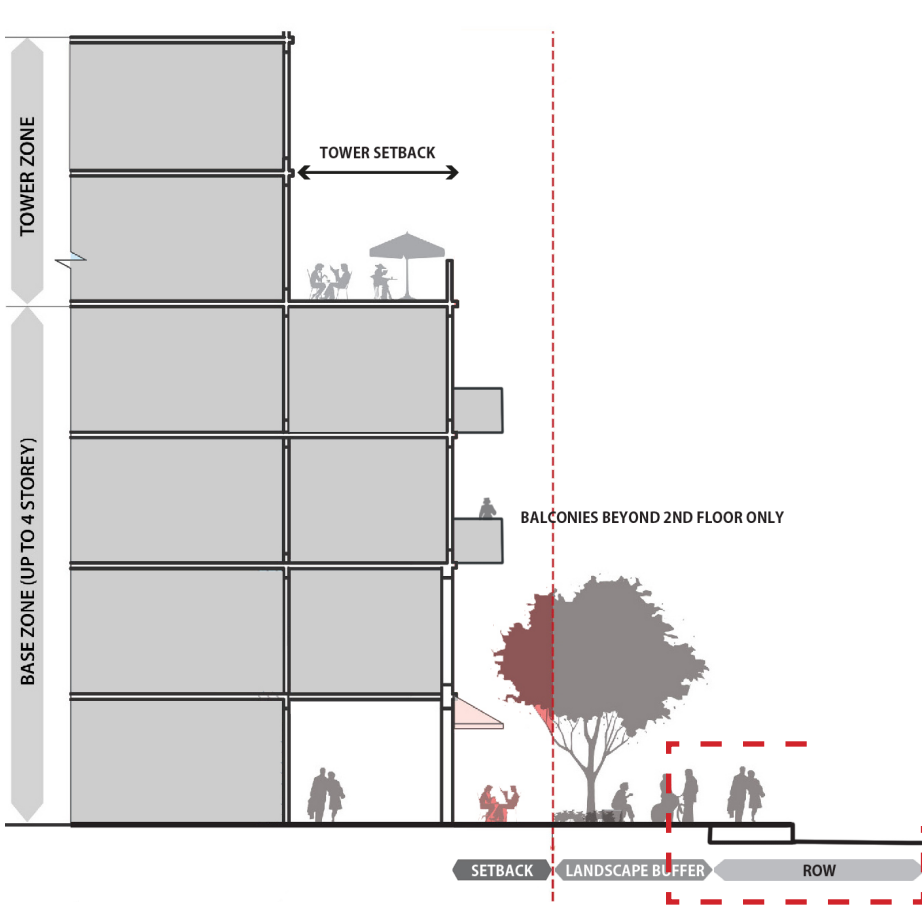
Extend sidewalks in the ROW to meet the base of buildings.(No boundary walls)
